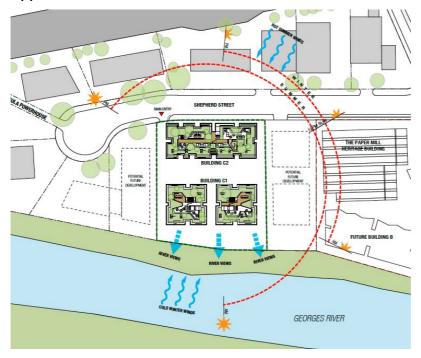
Site Plan and contextual analysis Source: Woods Bagot
